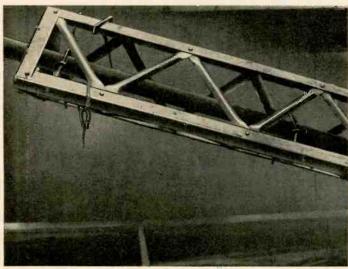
Top section installed on tower. Hook bolts interlock to hold mast in center of tower.
